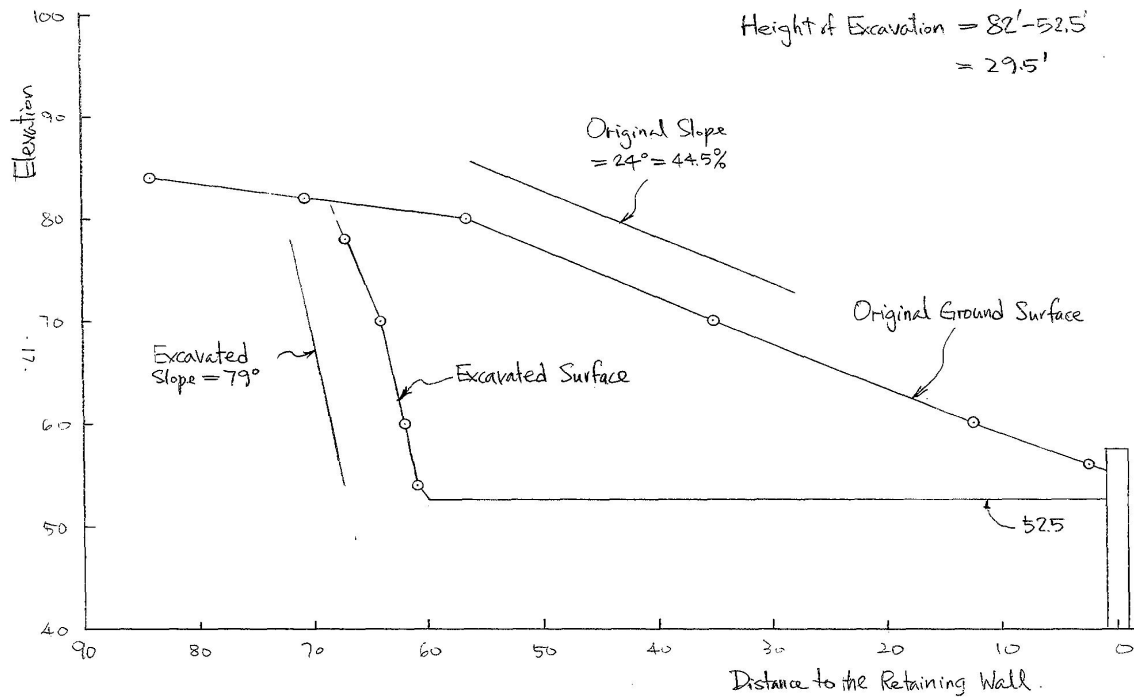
Cross Section of the Original Ground Surface and the Excavated Surface, North of the Collapsed Area (168 feet from the North End of the Retaining Wall).
